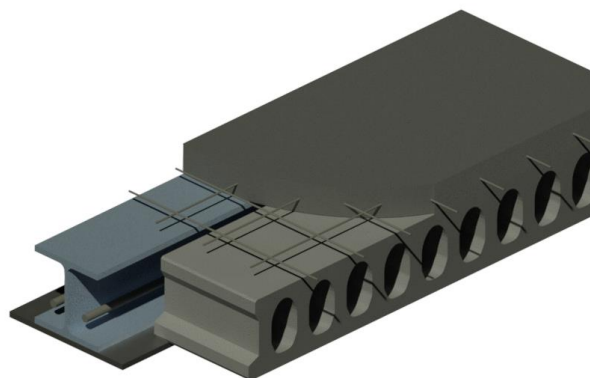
Slim-floor beam with hollow core slabs. 3D general view [42]
